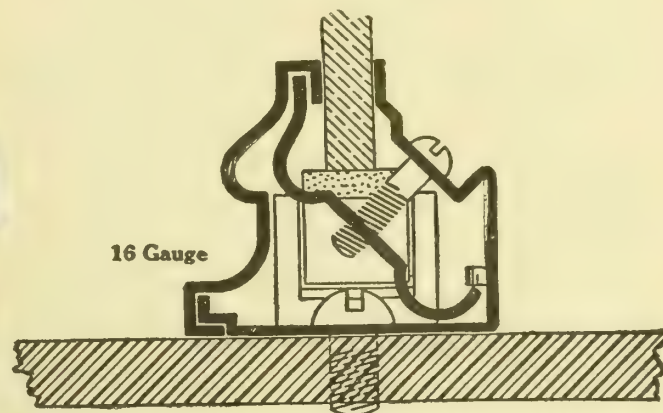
APPLICATION OF "EASYSET" CONSTRUCTION TO STEEL SILL WITHOUT WOOD BACKING
